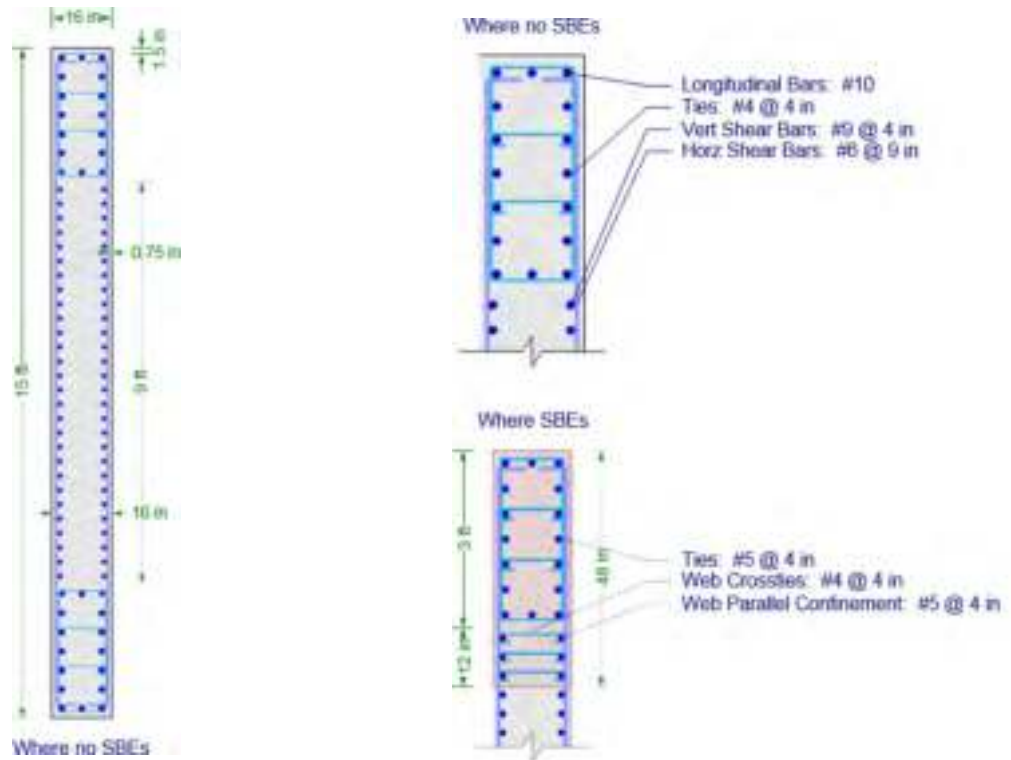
Building (B1-6S-H-S) Special RC Shear Reinforcement Details; Wall Section for Floors 1-3
